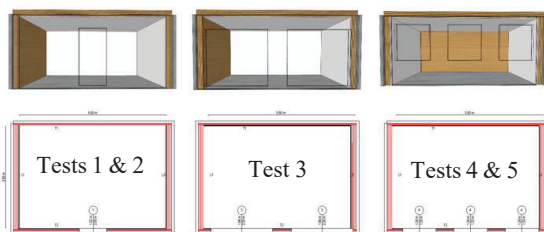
Compartment plan with 3D view illustrating the opening configurations (W1: left wall, W2: right wall, W3: back wall, W4: front wall with openings). Tests 1&2 (W1 exposed), Test3 (W1 exposed), and Test 4&5 (W3 exposed).
